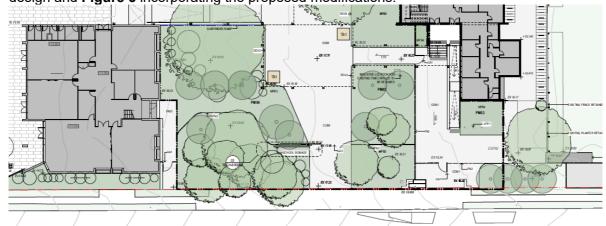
Approved CAPA/ Building A Entry/ Landscape
